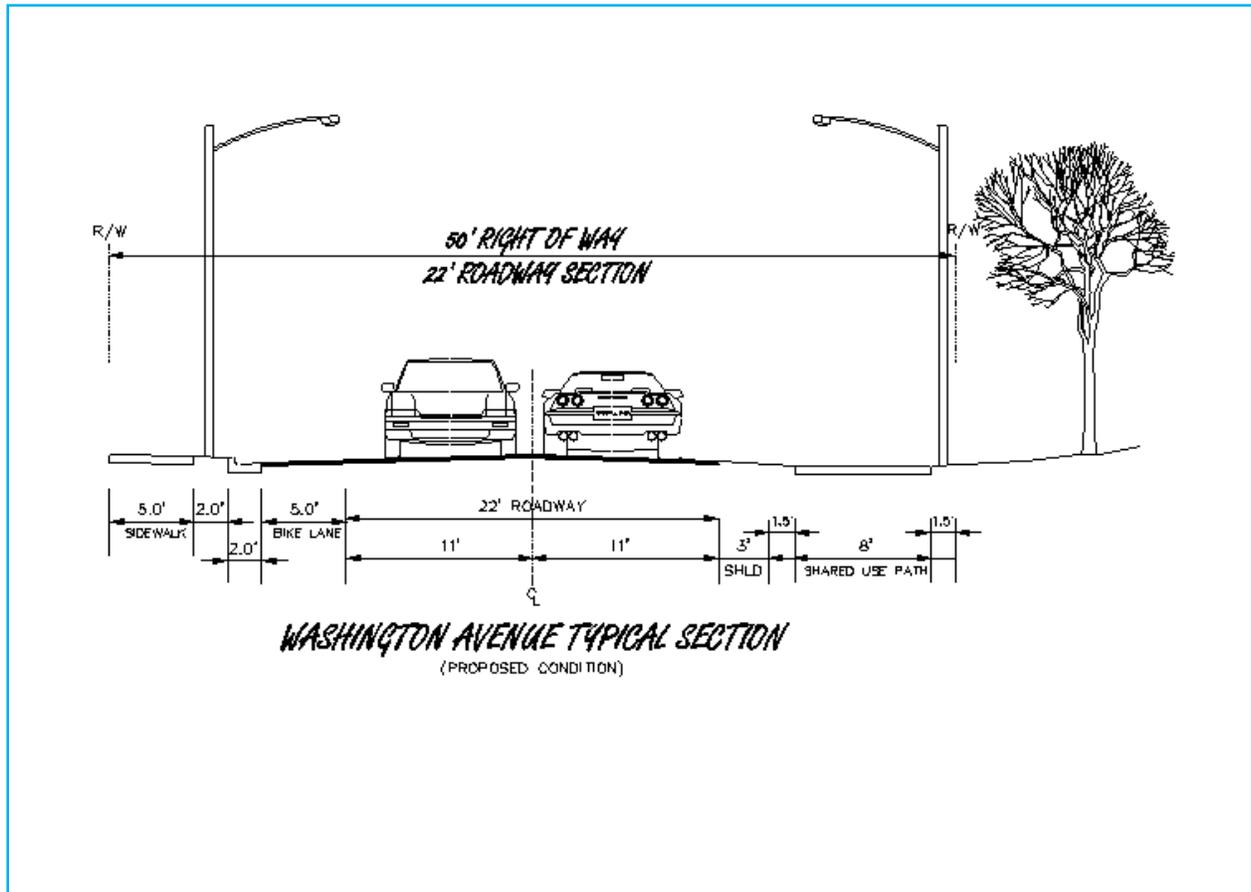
WASHINGTON AVE. TYPICAL SECTION – 50’ R/W – 22’ PAVEMENT WIDTH – 8’ SHARED USE PATH AND 5’ BIKE LANE AND 5’ SIDE WALK SCENARIO
